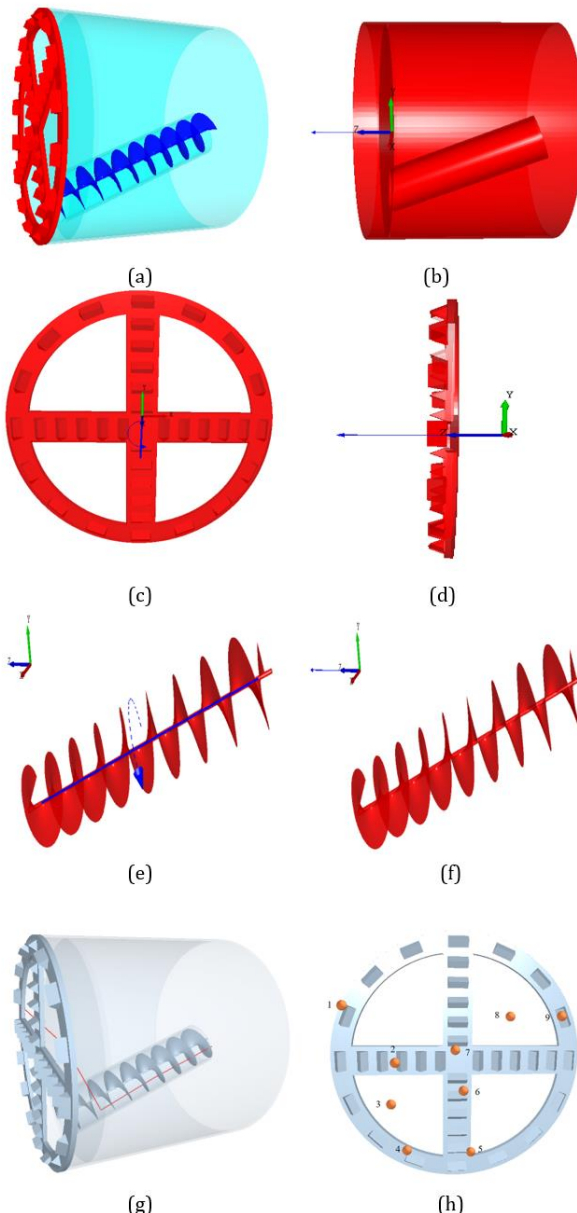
Shield tunneling model and movement posture of each component; (a) Shield machine model; (b) Horizontal movement of shield; (c) Rotational movement of cutterhead; (d) Horizontal movement of cutterhead; (e) Rotational movement of screw conveyor; (f) Horizontal movement of screw conveyor; (g) Particle trajectory. (h) Particle monitoring
